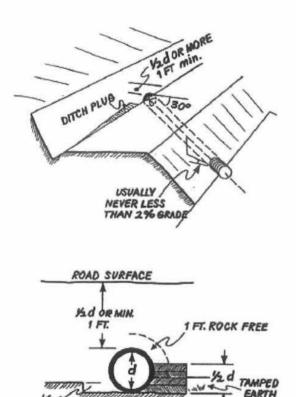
The elements of a properly installed ditch relief culvert. The culvert is angled at about 30 degrees to the road alignment to help capture flow and prevent culvert plugging or erosion of the inlet area. It is set at the base of the fill (ideally) or with a grade slightly steeper than the grade of the contributing ditch (but never with a grade less than 2 percent) (USDA-SCS, 1983). At a minimum, the grade of the ditch relief culvert should be sufficient to prevent sediment accumulation at the inlet or deposition within the culvert itself (it should be self-cleaning) (USDA-SCS, 1983).
